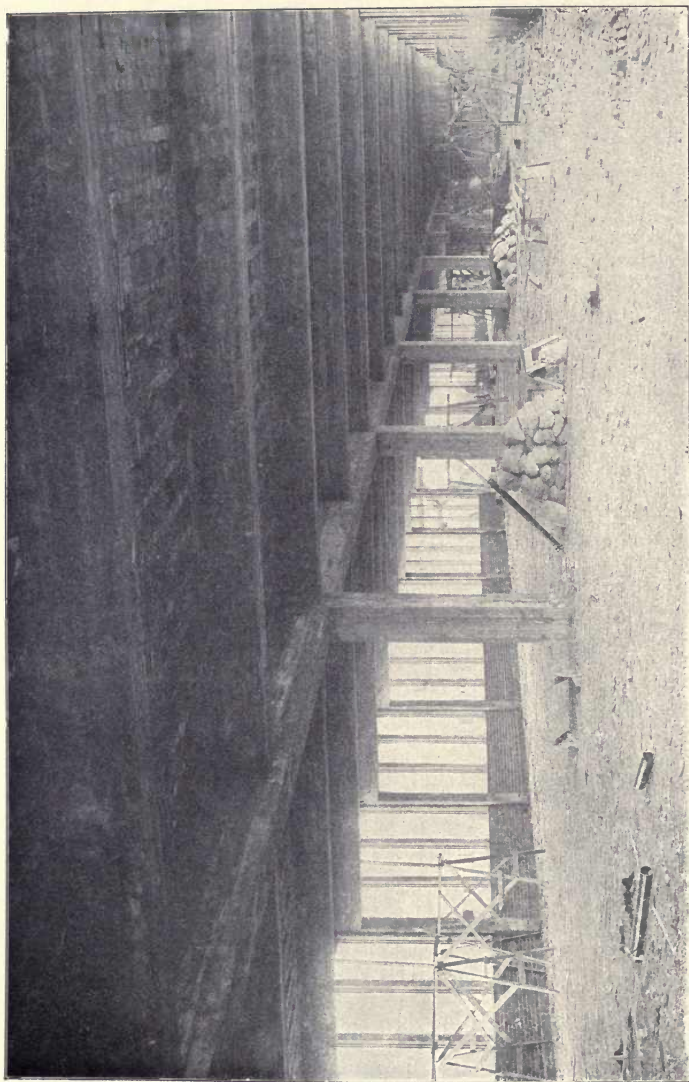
Interior View of Packard Factory under construction. (See p. 138.)
